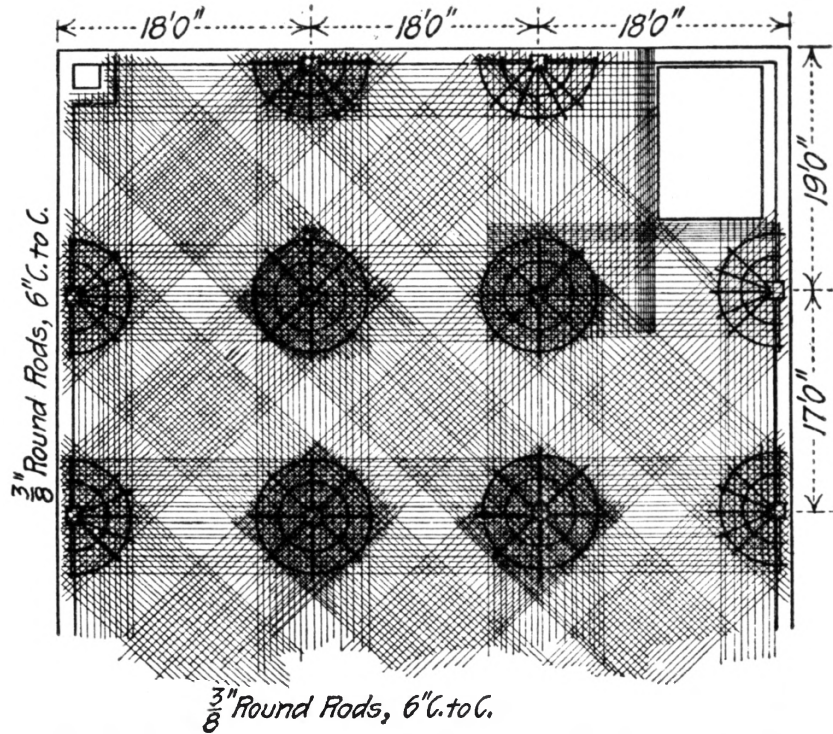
STRUCTURAL DETAILS OF REINFORCED
